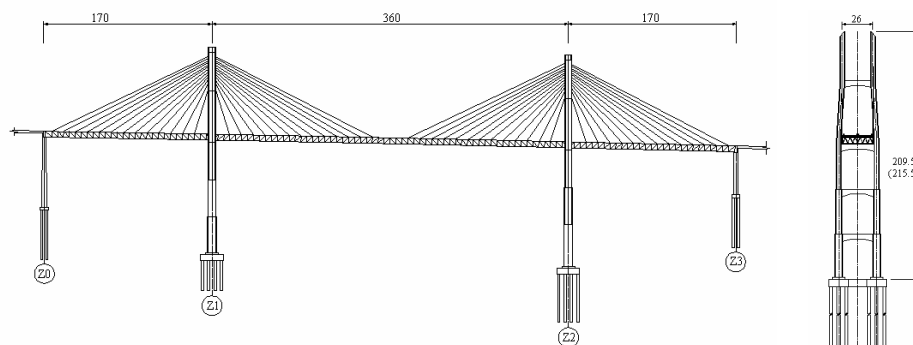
Elevation of the Guozigou Bridge (units: m)
